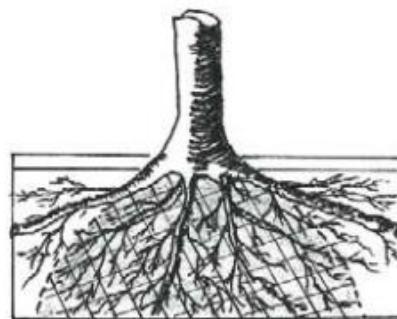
Tree pit design: Options for planting pit where site constraints are non-existent or minimal
